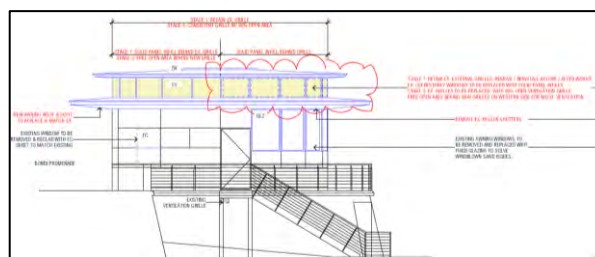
Proposed modifications to east elevation of Lifeguard Tower, Tunnel 2 and Amenities block.
